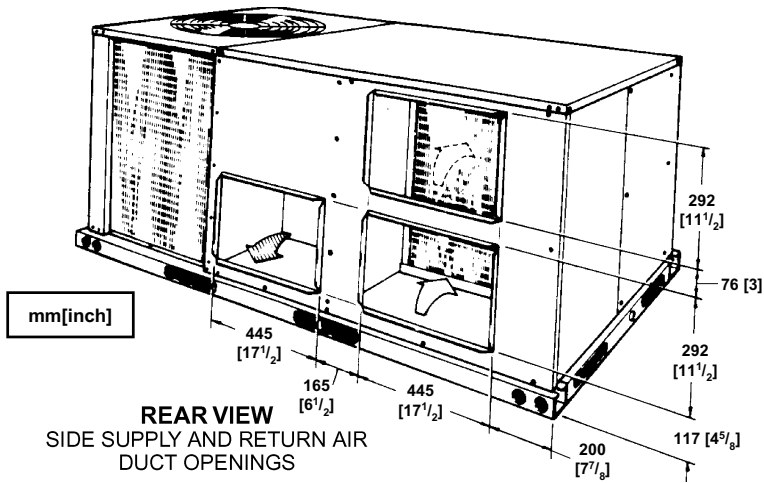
UNIT DIMENSIONS (REAR VIEW)
